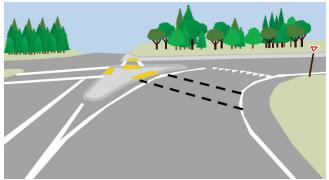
Unmarked Crosswalk Connecting Curb Ramp and Shoulder across a Channelized Turn Lane
